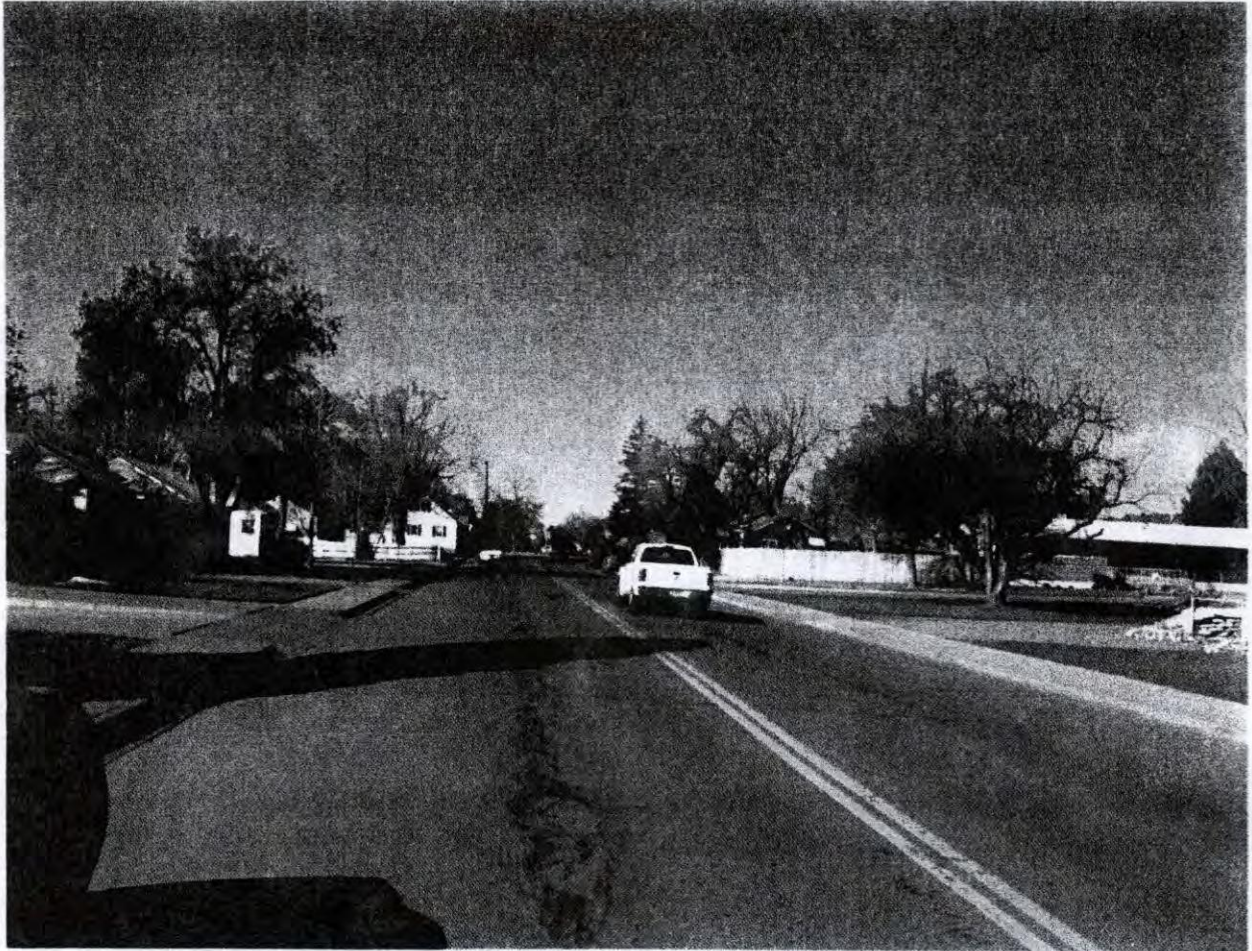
Overview of 1200 block of Parkhill Drive looking west toward 13th Street West.
